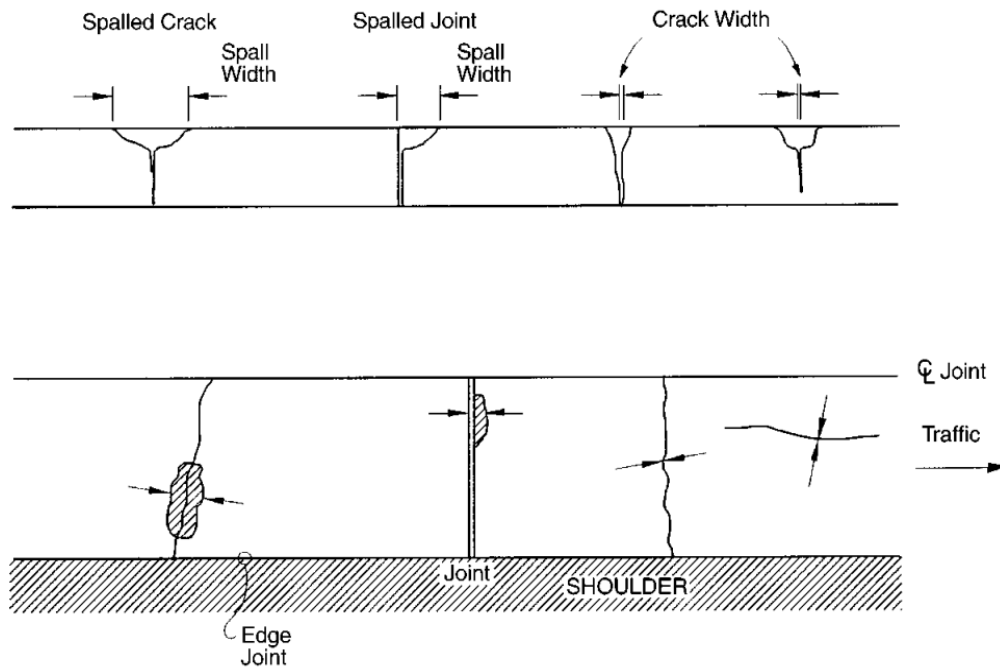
FHWA Spalling Crack Width Measurement [27]
